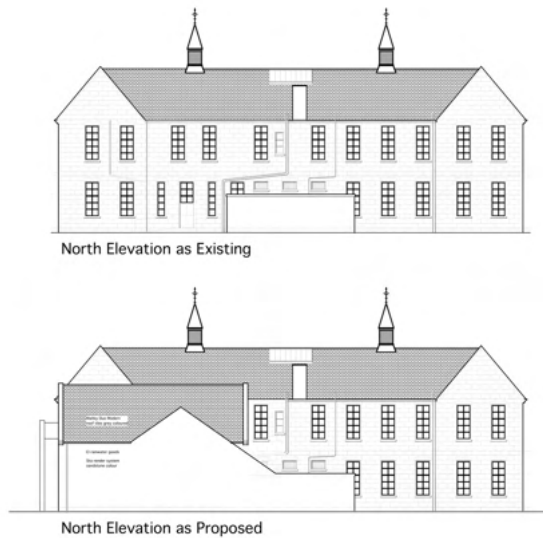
North Elevation as Existing and Proposed. Assessment relevance: Rear/north elevation showing proposed extension relationship with the existing building. Source: Padrino Design drawing pack, job no. 2499, 311 Calder Street, Glasgow G42 7NQ.
